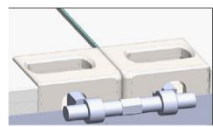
SolBank anchoring in corner position. Refer to details for site specific design by EOR.
